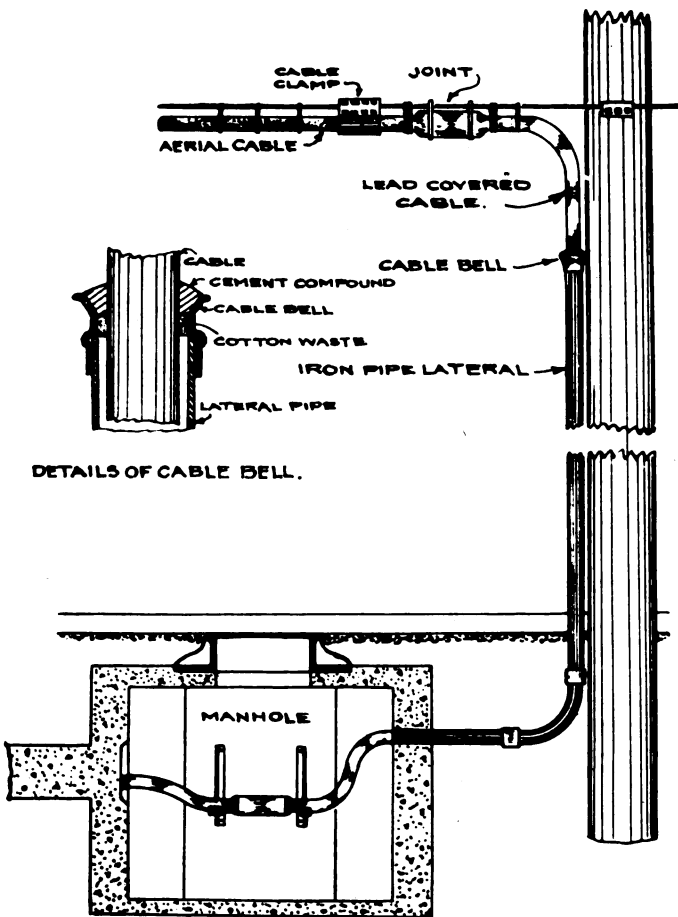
METHOD CONNECTING UNDERGROUND CABLE TO AERIAL CABLE.
